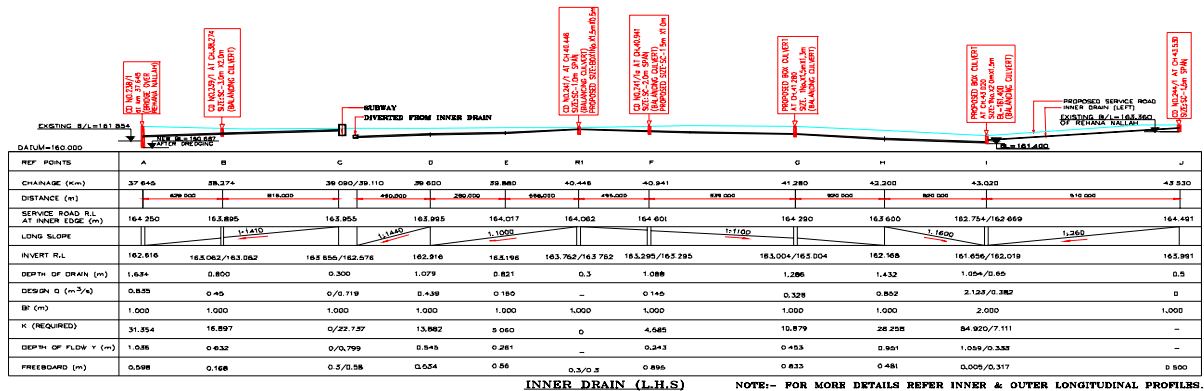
Typical Plan and Section of Drains for NH-2 Passing Through Firozabad Town in U.P
